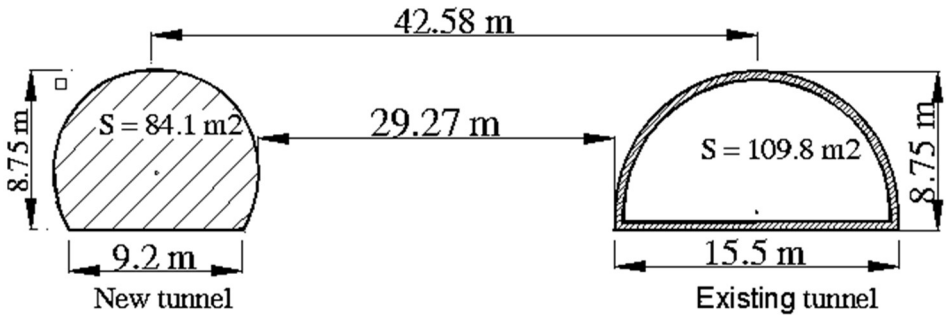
Construction of two parallel tunnels in Croix-Rousse tunnel, Lyon, France
